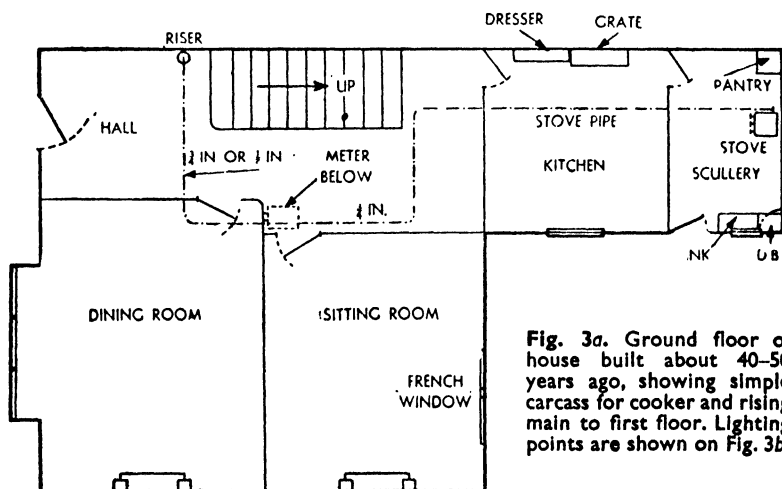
Ground floor of house built about 40-50 years ago, showing simple carcass for cooker and rising main to first floor. Lighting points are shown on Fig. 3b.
